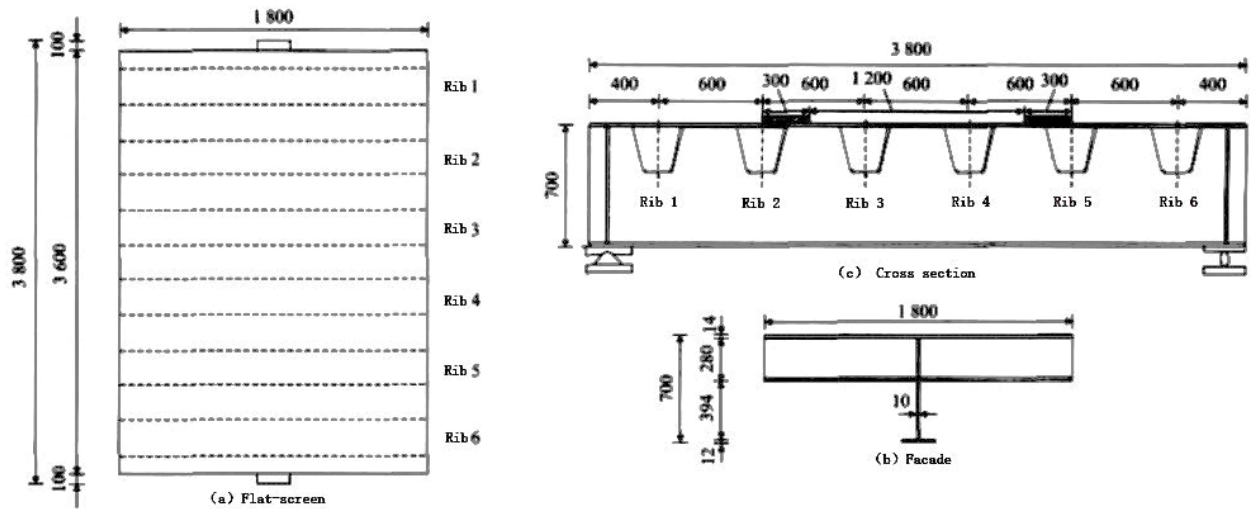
Dimensions of the Full-scale Test Model and the Stiffening Ribs [mm]
